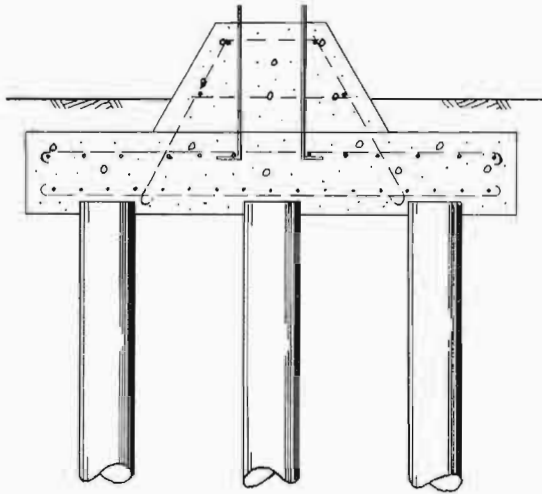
Base pier of reinforced concrete on piles for use in poor soils.
